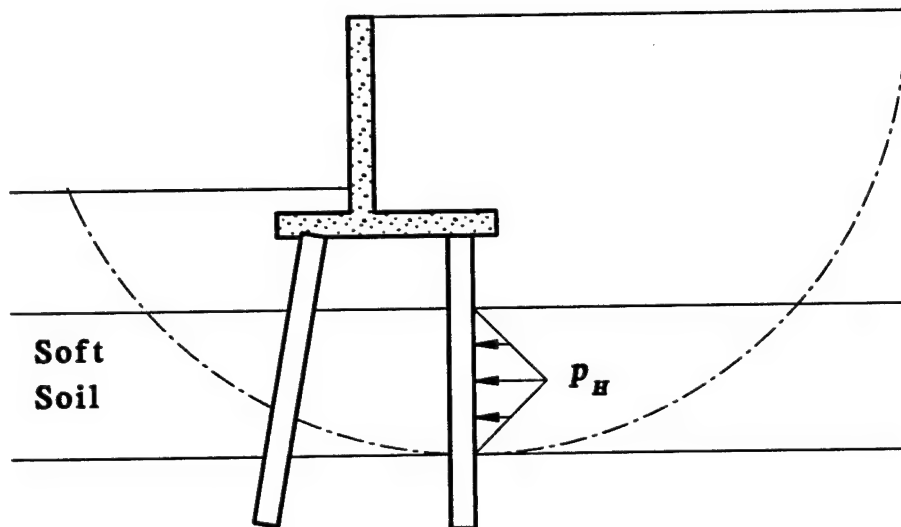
Forces acting on pile foundation (after Tschebotarioff (1973))
